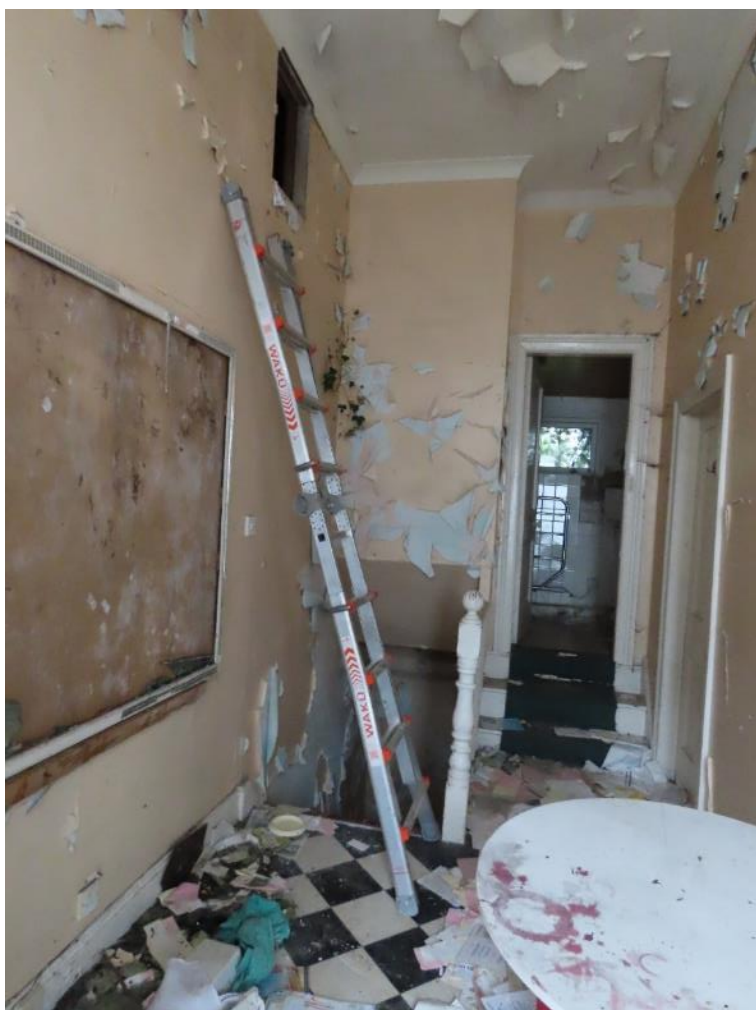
access to eastern attic space gained via hatch in wall of reception area
